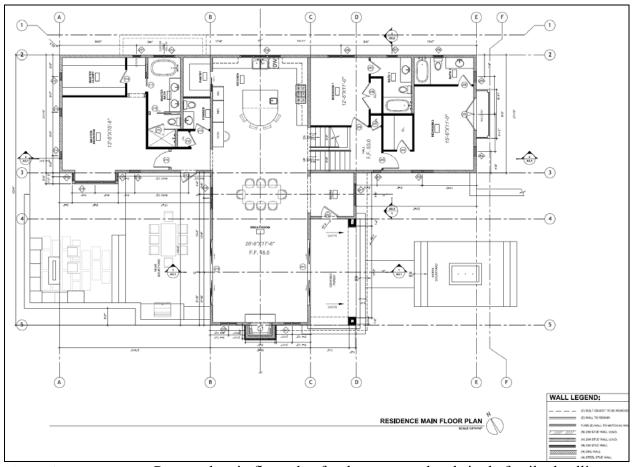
Floor Plan: Proposed main floor plan for the new two-level single family dwelling at 26338 Valley View Avenue.
